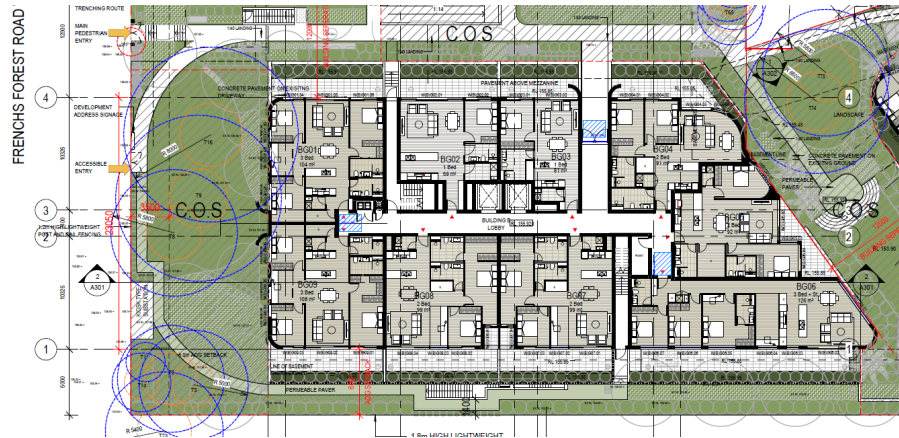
Landscape Setbacks for Building B (Previous Scheme - Rev A)
